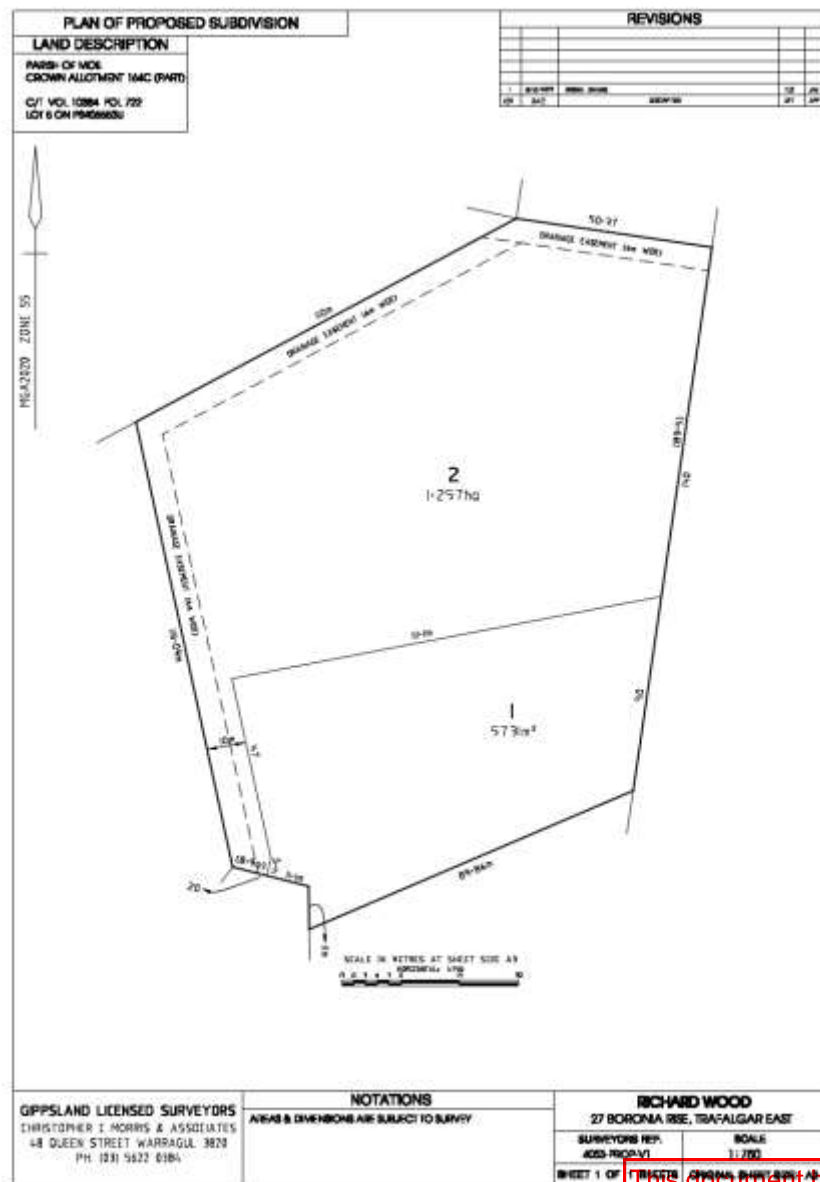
PLAN OF PROPOSED SUBDIVISION TO BE ENDORSED UNDER THIS PERMIT
